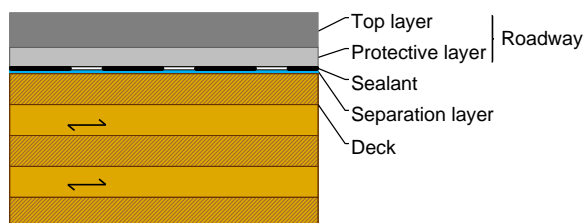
Sketch of a system without a shear connection between asphalt and bridge deck
